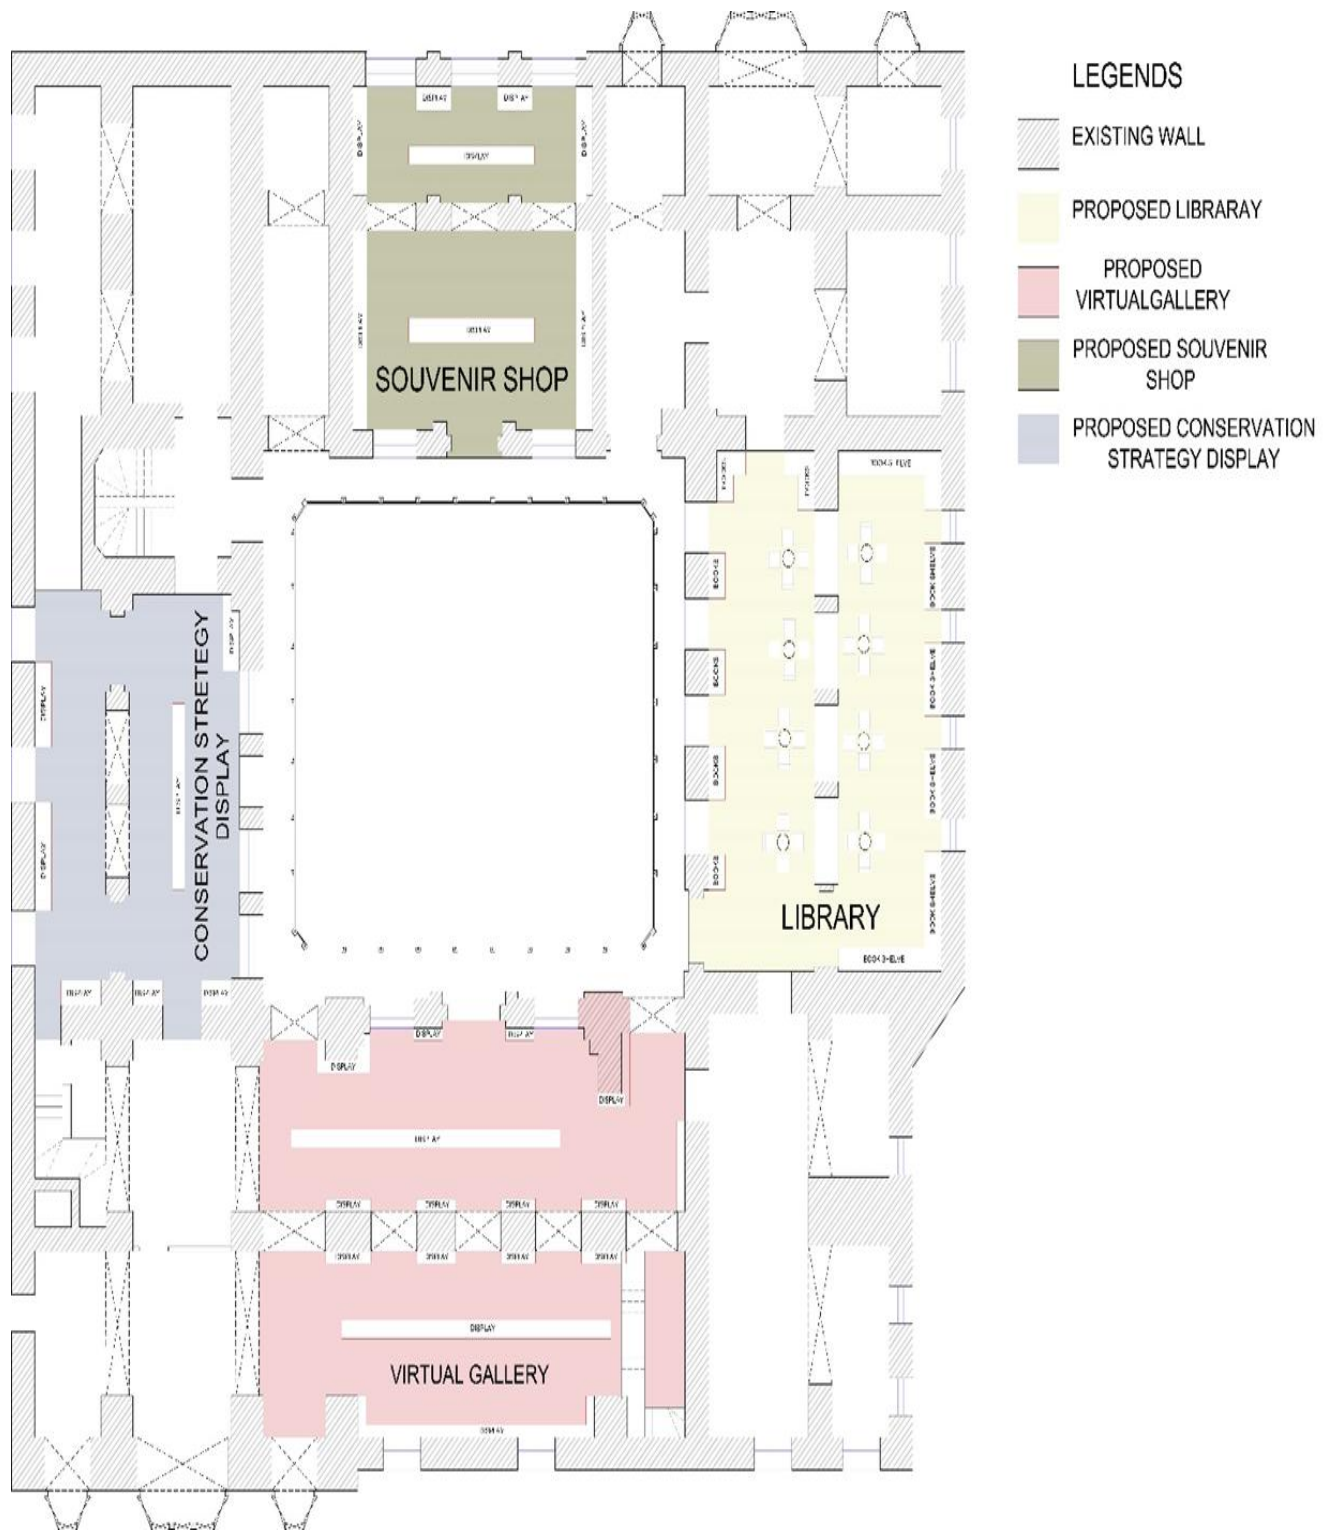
Layout plan of suggested interventions on First Floor of Haveli for limited access
